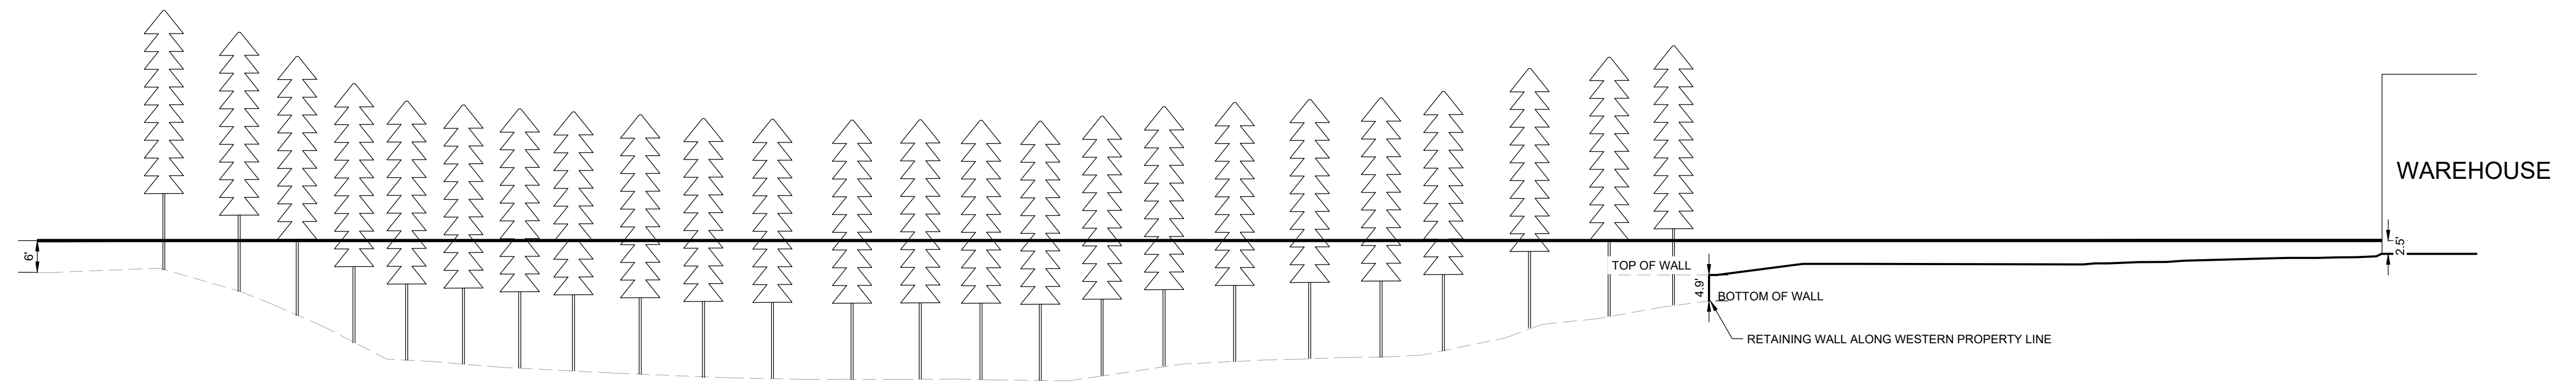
EXHIBIT A - SOUTHERN RETAINING WALL VIEWSHED SECTION
